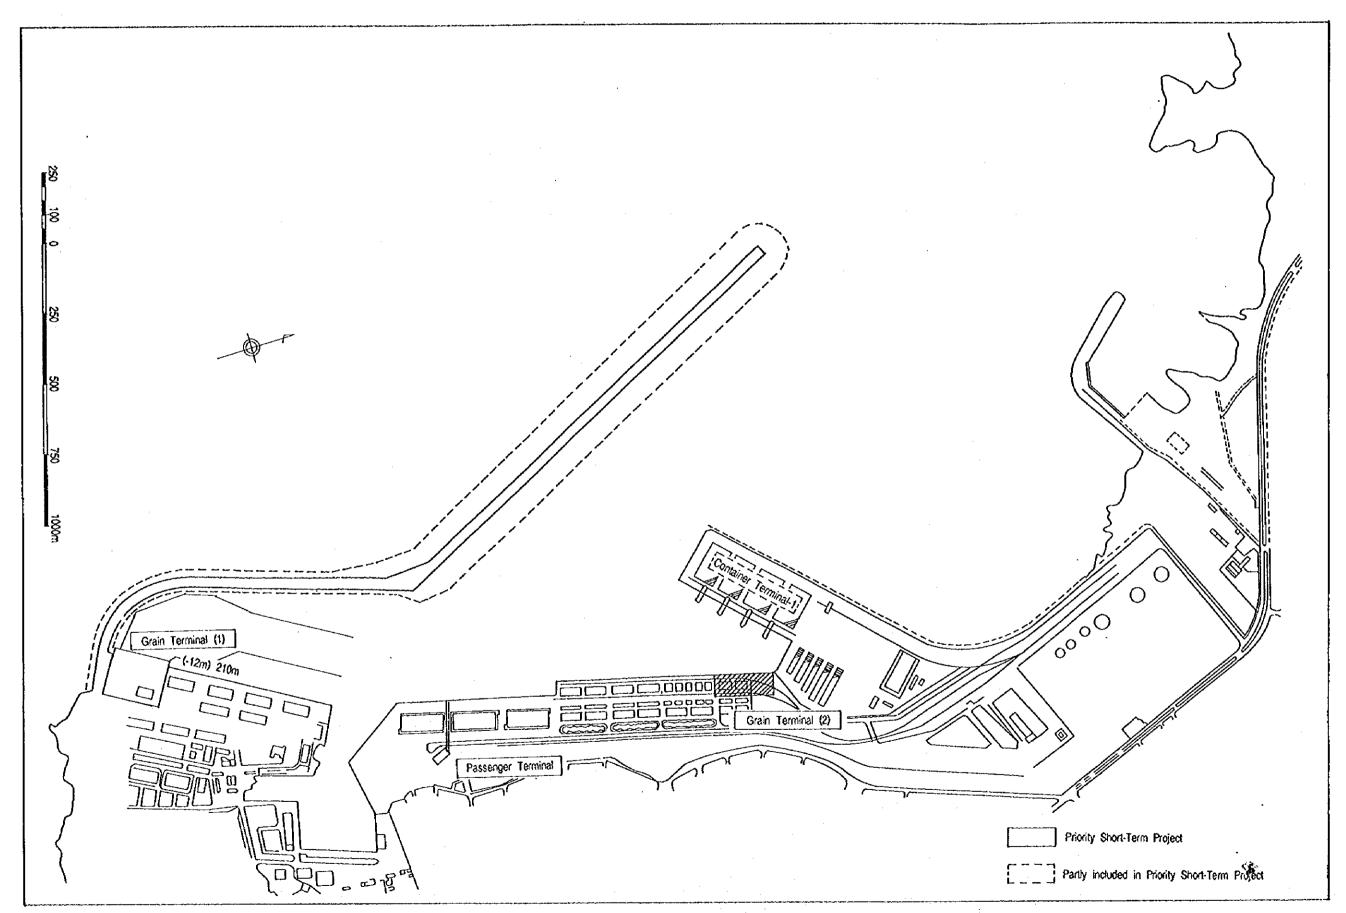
LAKAKIA PORT Short-Term Plan
